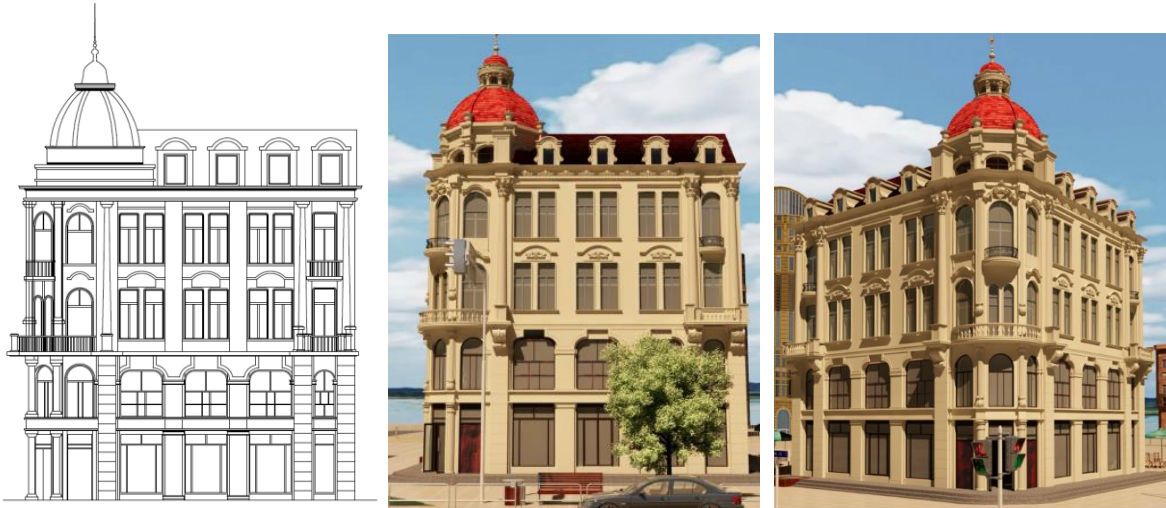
Façade plan and rendered. 3D view of the building (Own elaboration)
